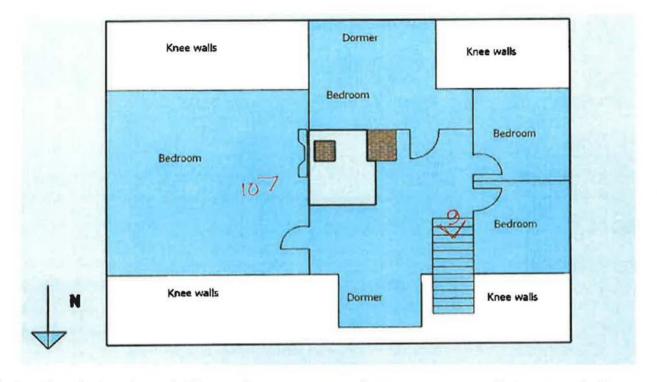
Second Floor of House at Marsh Stream Farm. Photos 9 and 10.
